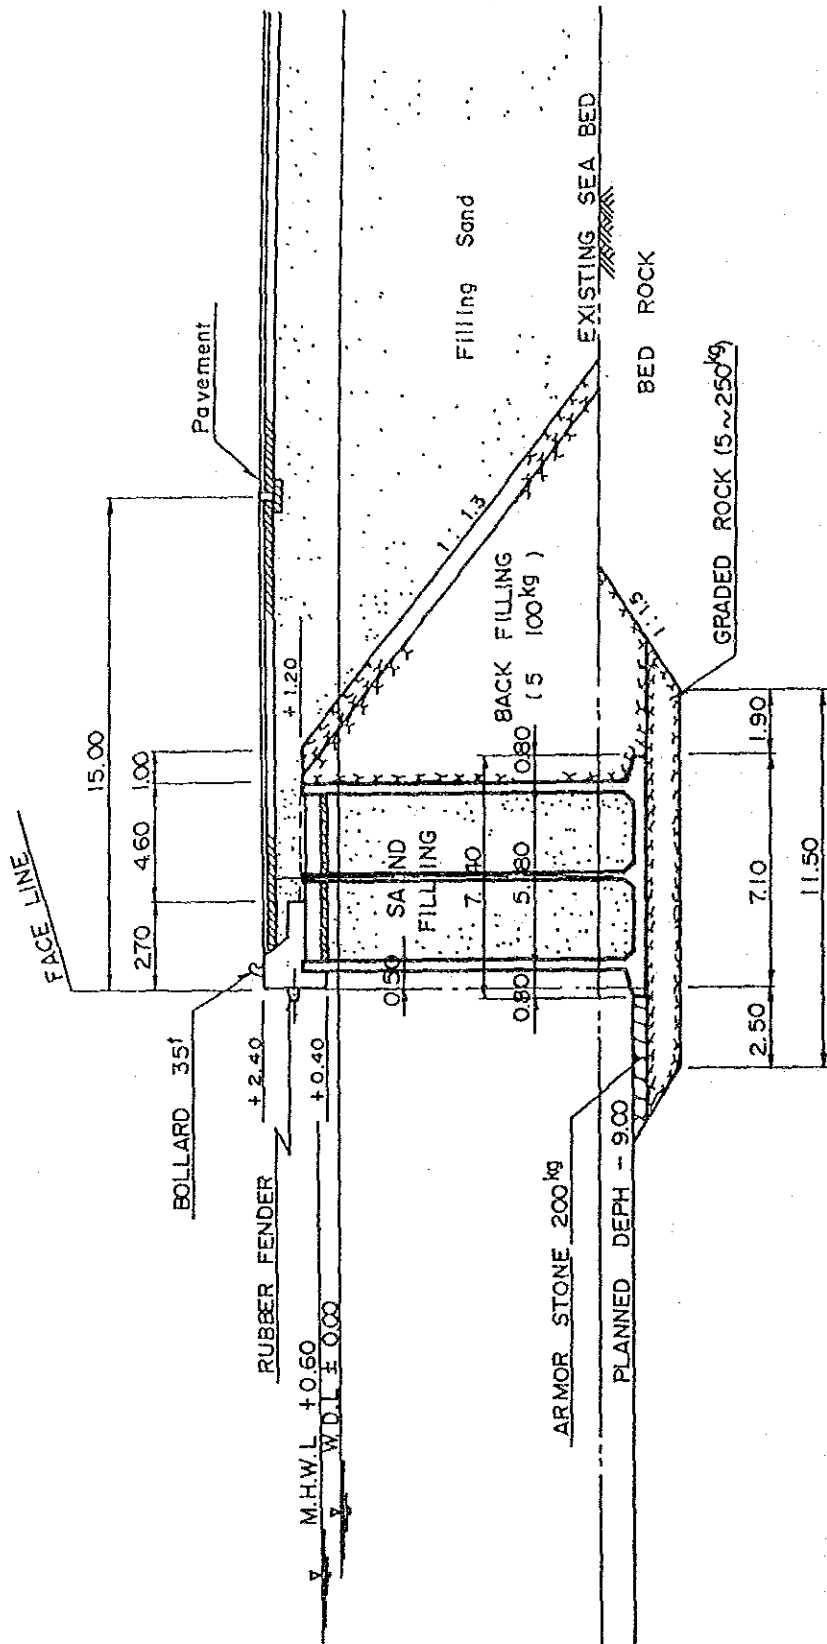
Typical Cross Section of Feeder Berth
